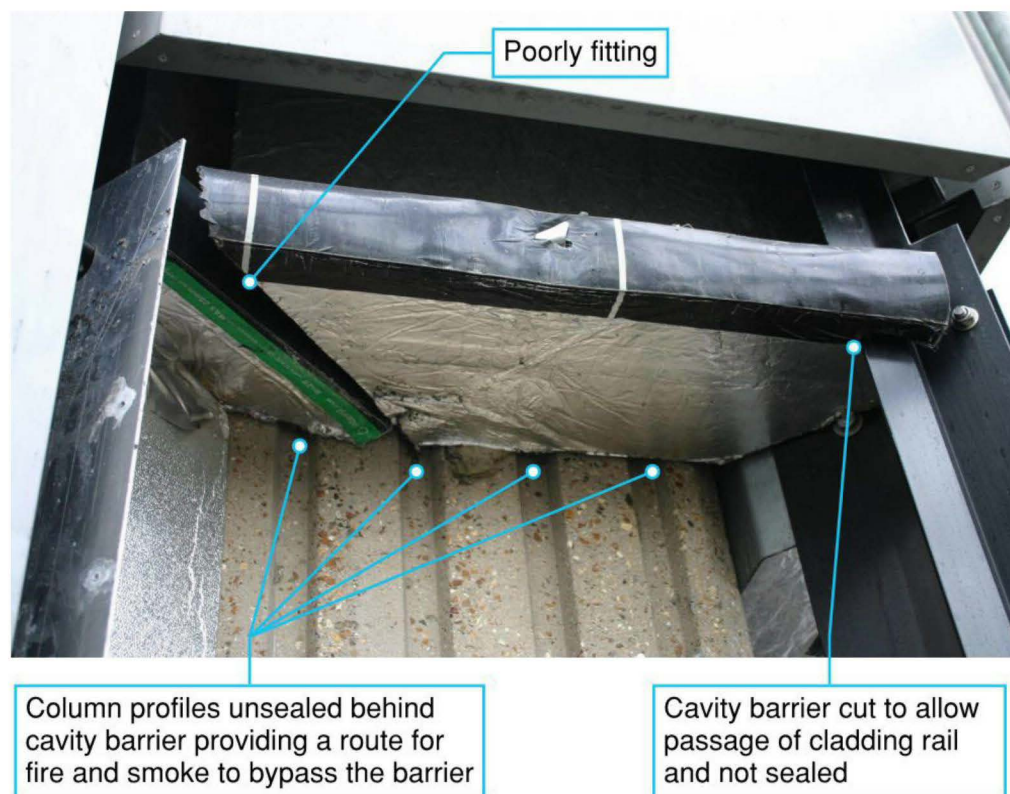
Horizontal cavity barrier in column cavity - floor 4, external Flat 12.
